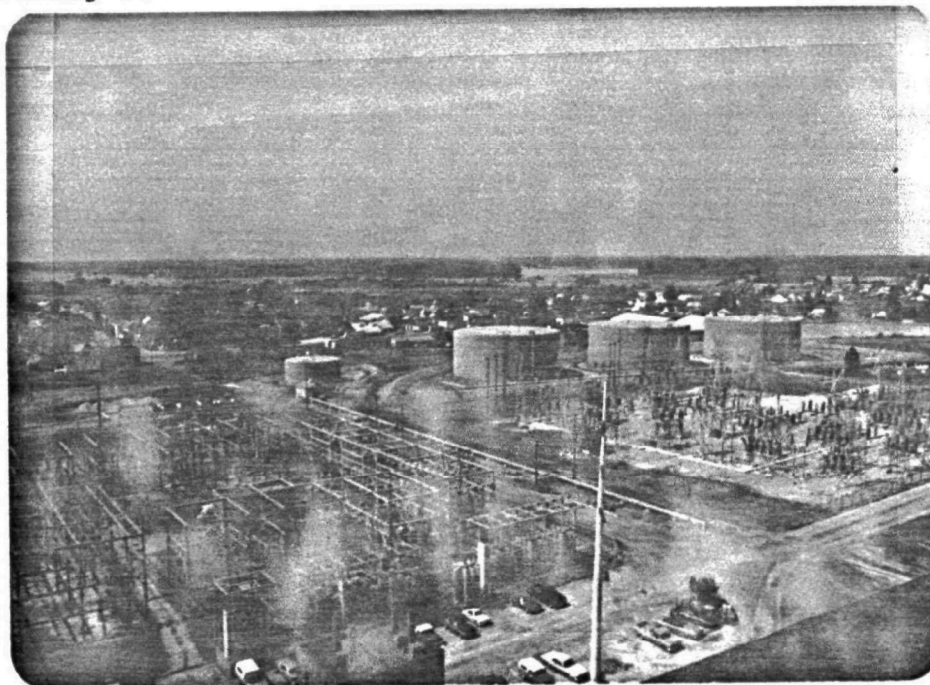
View from the roof of Boiler 8 facing southwest showing the electrical substation and the oil storage facilities.
